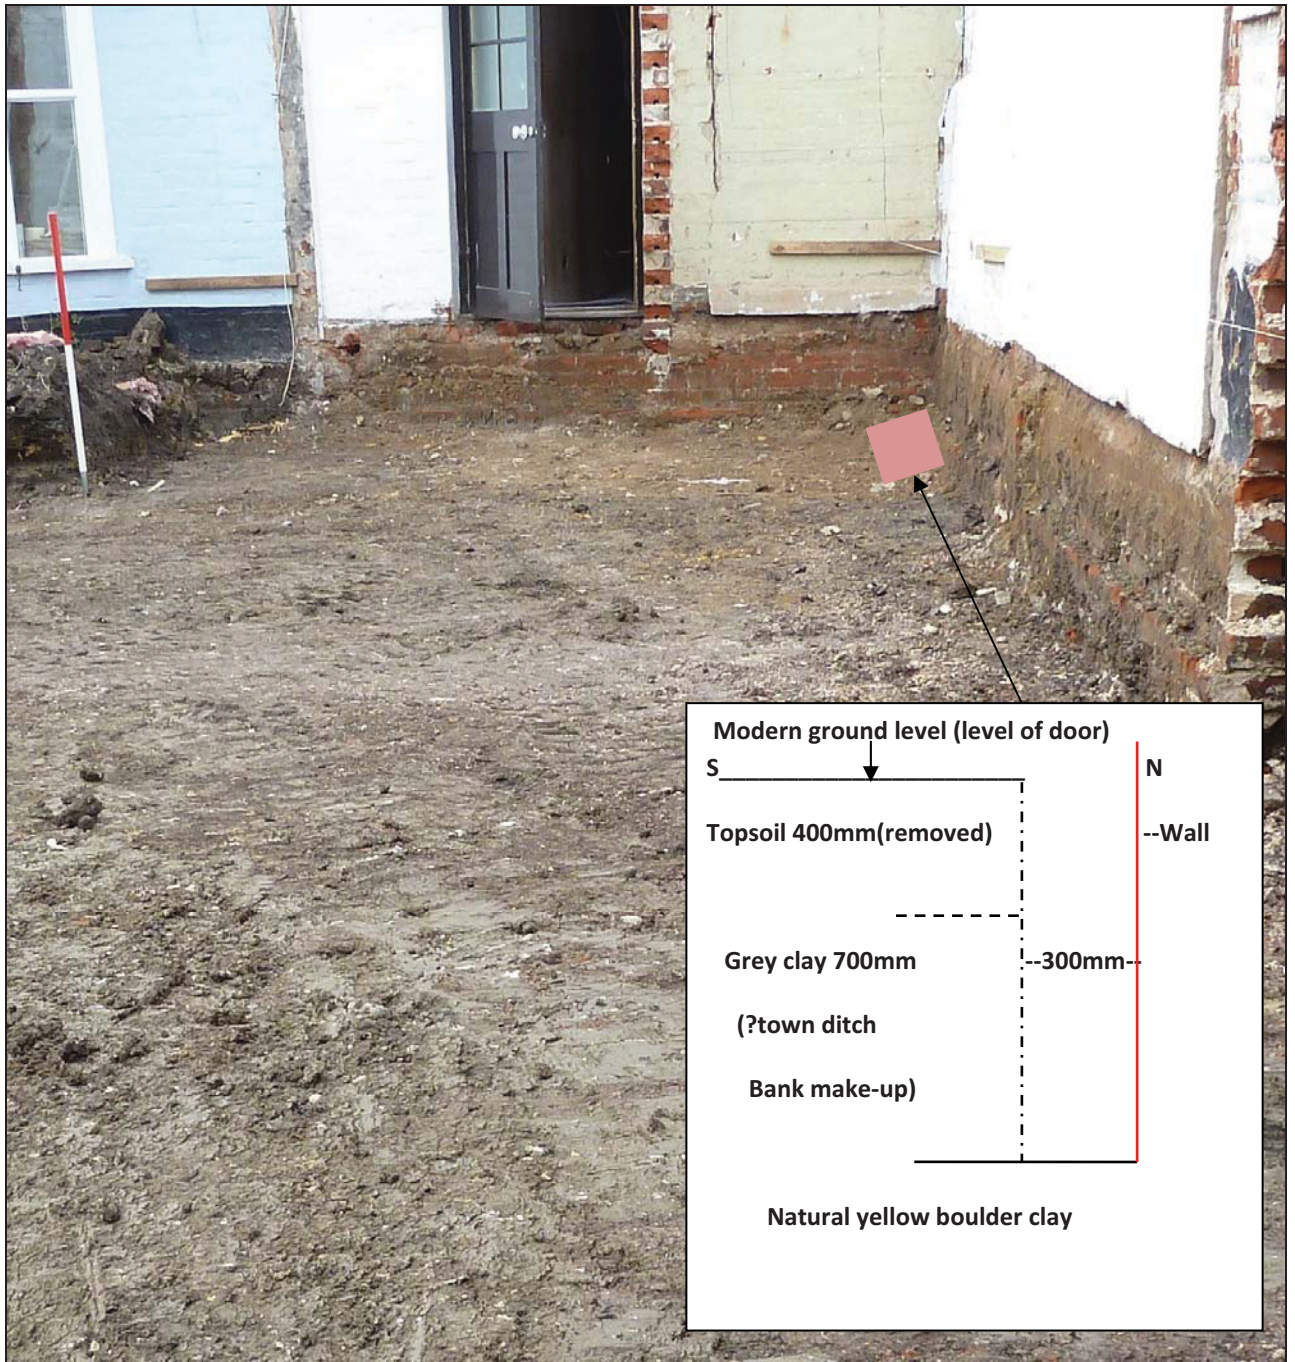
Image of extension footprint with 400mm topsoil removed and schematic section reconstruction of the deposits seen briefly in one small test pit (before foundation plan was changed from strip footings to a raft)- modern ground level 40.10m OD.
